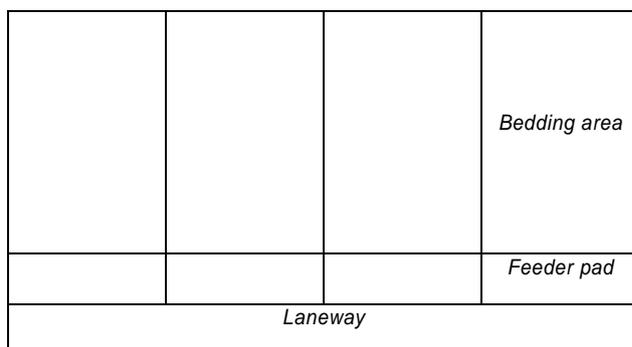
DLH floor plan with feeder pad along the southern wall and divided into smaller pens plus an access laneway (not to scale).
